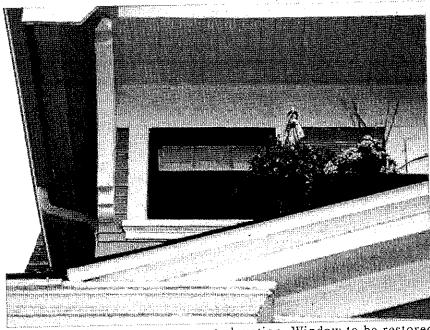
6-lite casement on east elevation. Window to be restored at this location.
